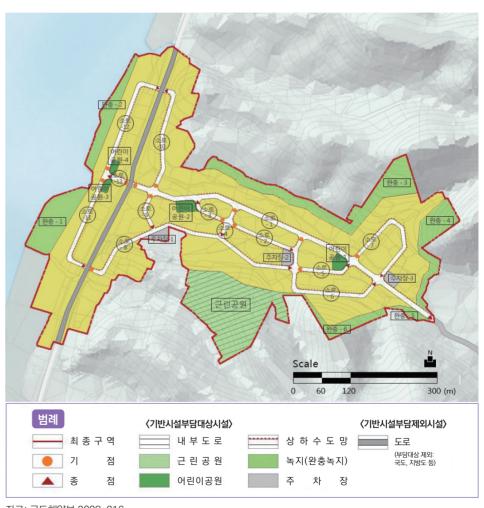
Example of Infrastructure Installation Plan (Yangpyeong-gun, Gyeonggi-do)
